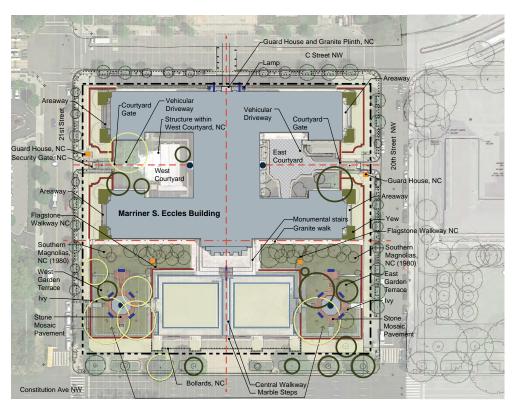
Alternative 2: Landscape Plan for the Eccles Building.
